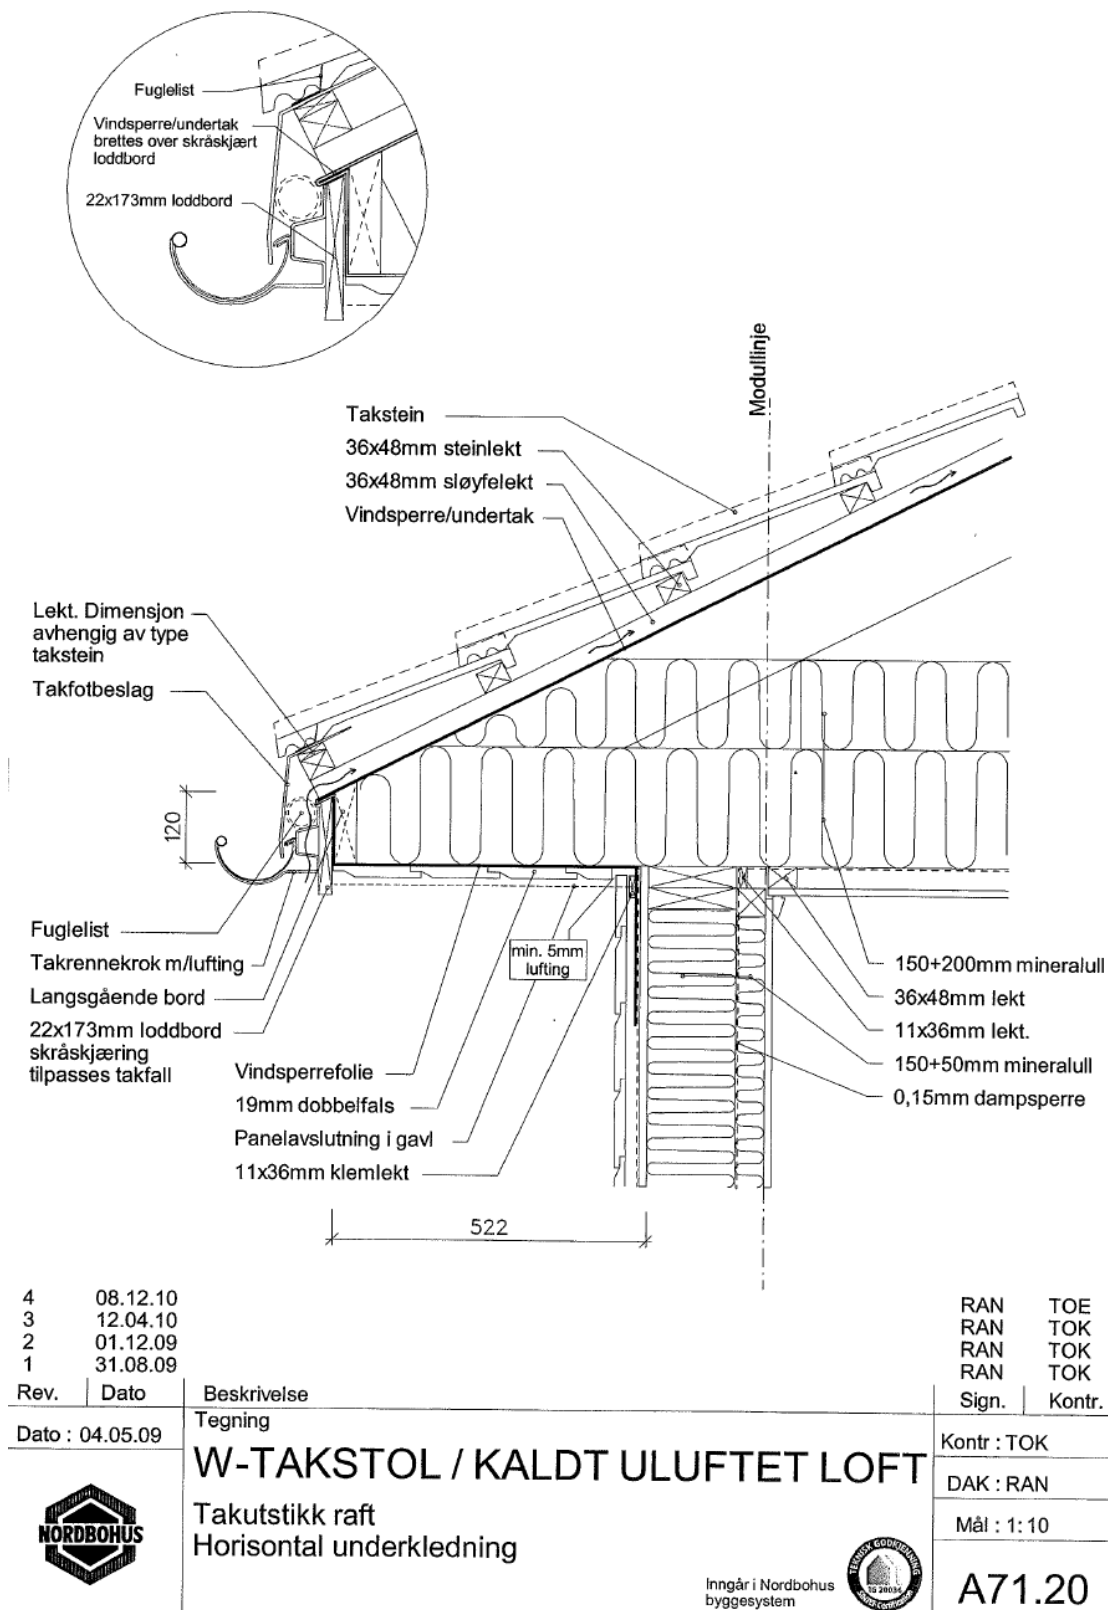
Technical drawing of the roof for TEK07 and passive house
